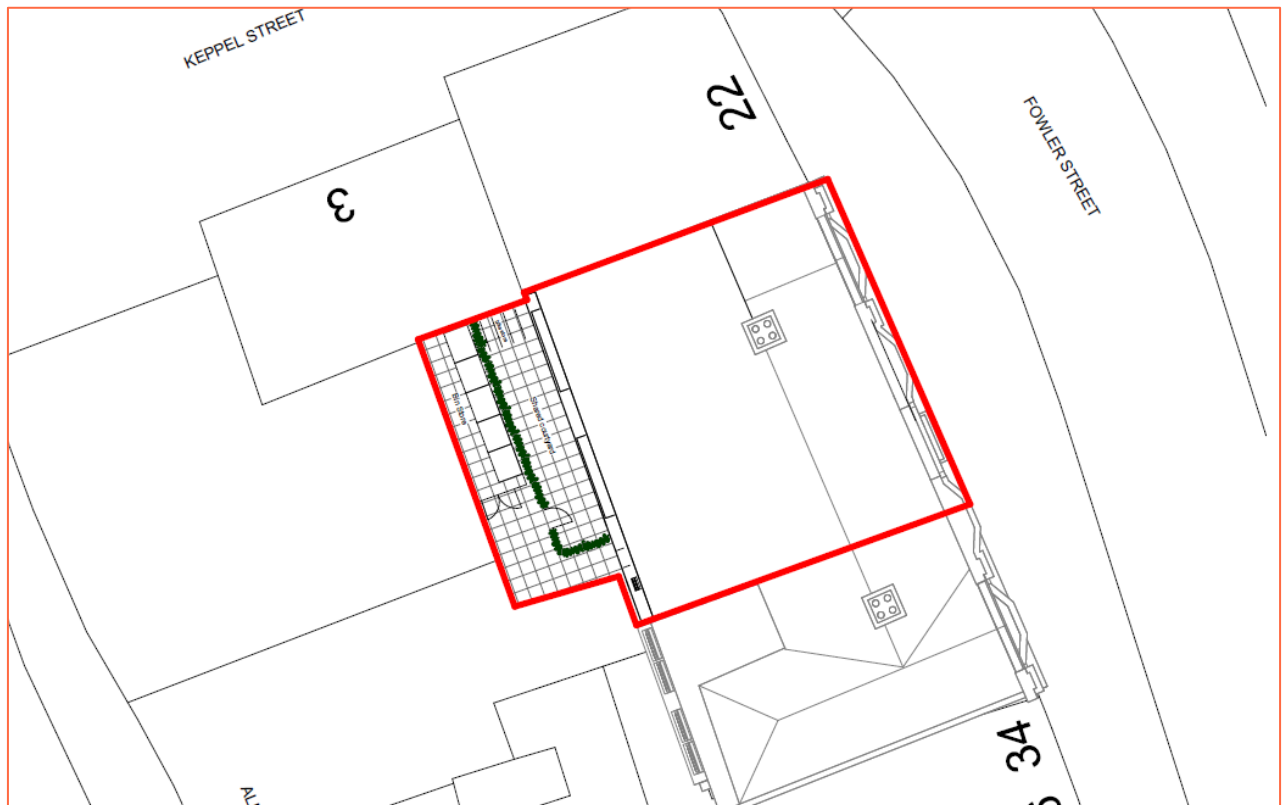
Proposed site plan – Fowler Street (Source: Create Architecture)
